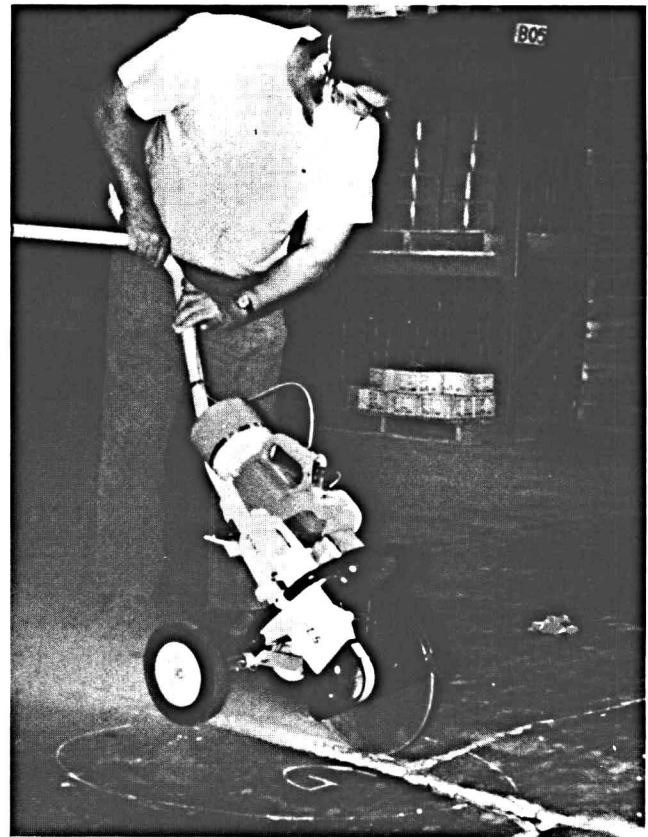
Spalled concrete at a joint can be removed by cutting with a saw.
